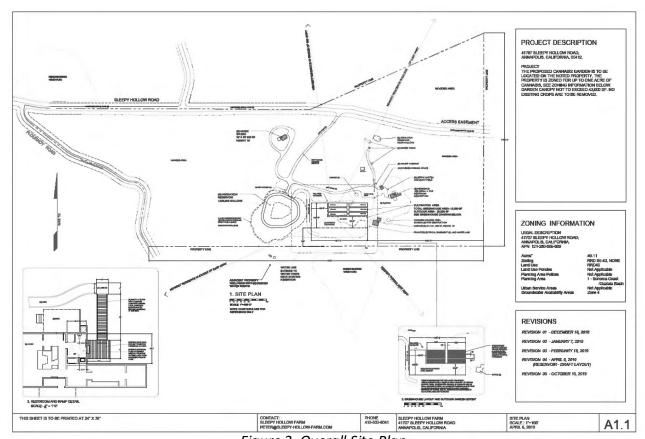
Overall Site Plan (Munselle Civil Engineering, 2019)
